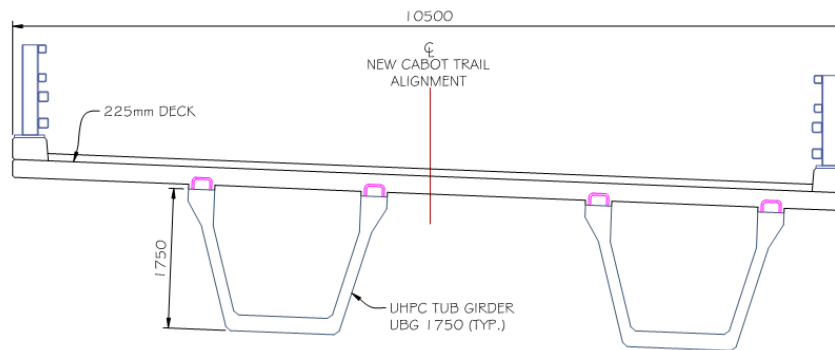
Cross-section of MacKenzie River Bridge: Alternative Design using UBG 1750 girders (UHPC)
